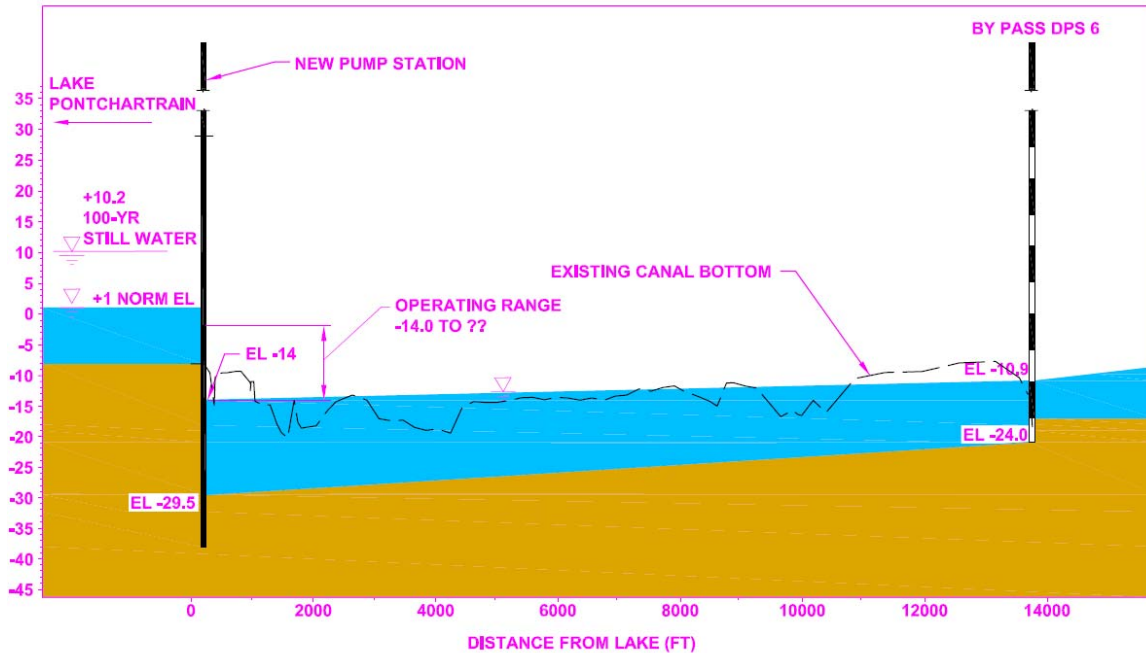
Option 2 Pump Station Typical Cross Section
